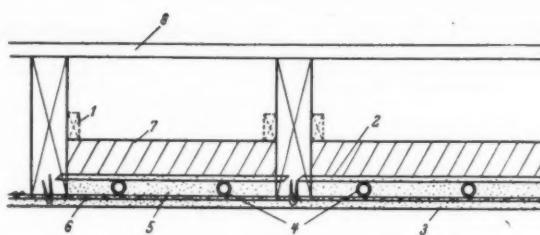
(above). Embedded ceiling panels, showing method of laying pipes. Fig. 6 (right). Embedded panel ceiling heating over living room in multi-storey block of flats.
